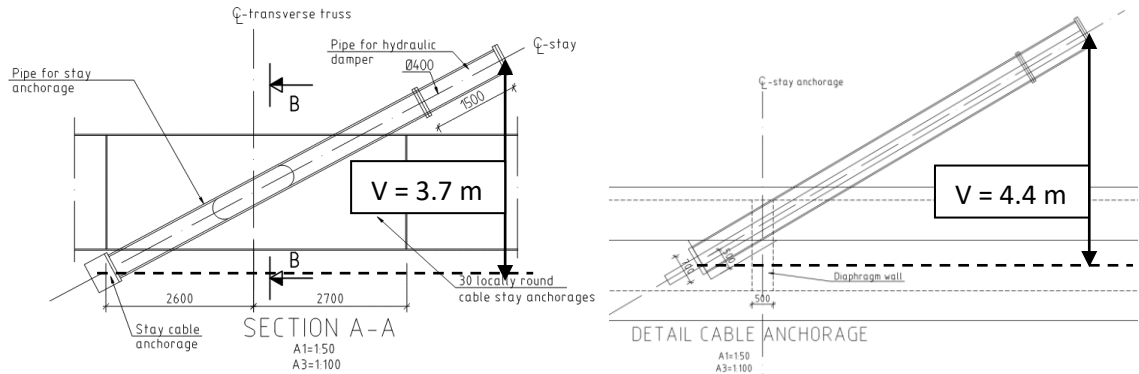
Stay cable tubes for steel main span (left) and concrete back spans (right) indicating assumed vertical distances H between cable anchorage and damper location. Excerpt drawings SBJ-33-C5-AMC-22-DR-103, SBJ-33-C5-AMC-22-DR-104.
